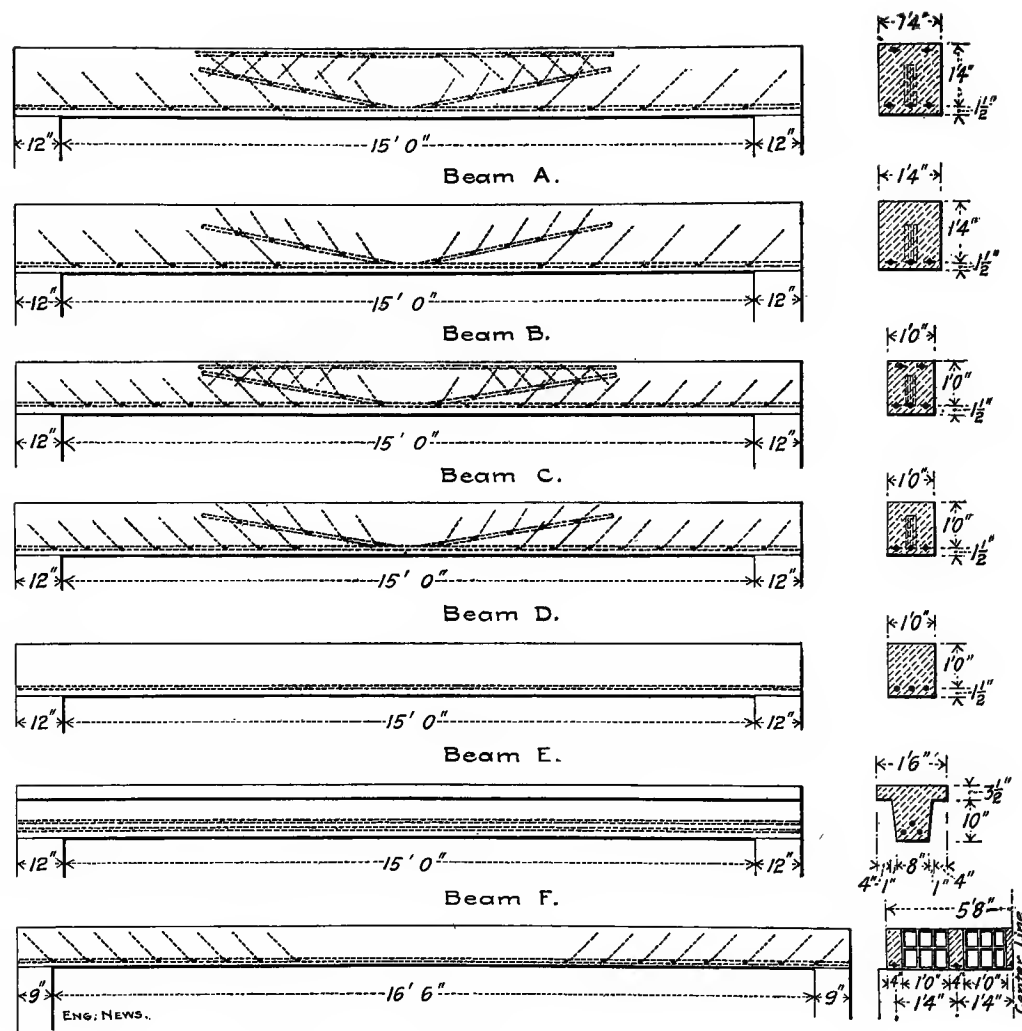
Diagrams of Test Beams and Floor Slab Showing Dimensions and Reinforcement.
